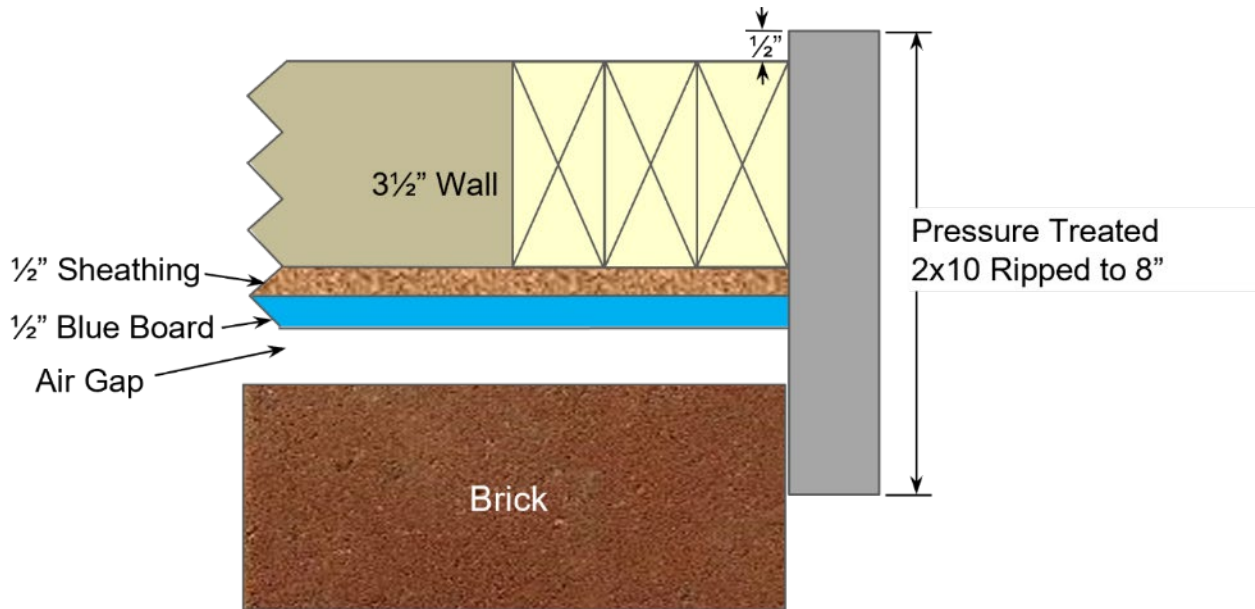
Placement of Ripped 2x10 for Garage Opening on Bricked Wall
